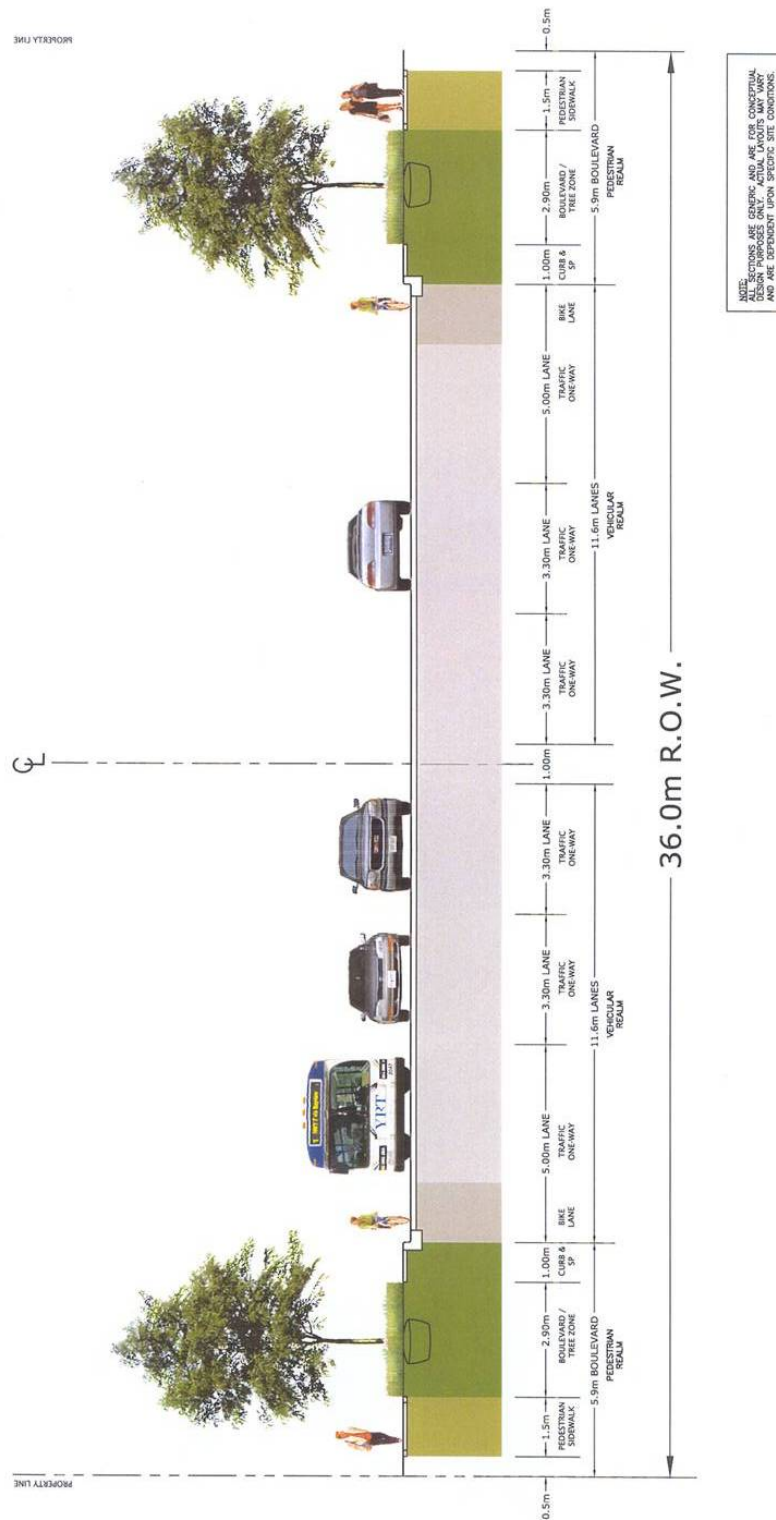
Example of an Urban Road Cross Section with 1.5 m Bike Lanes
